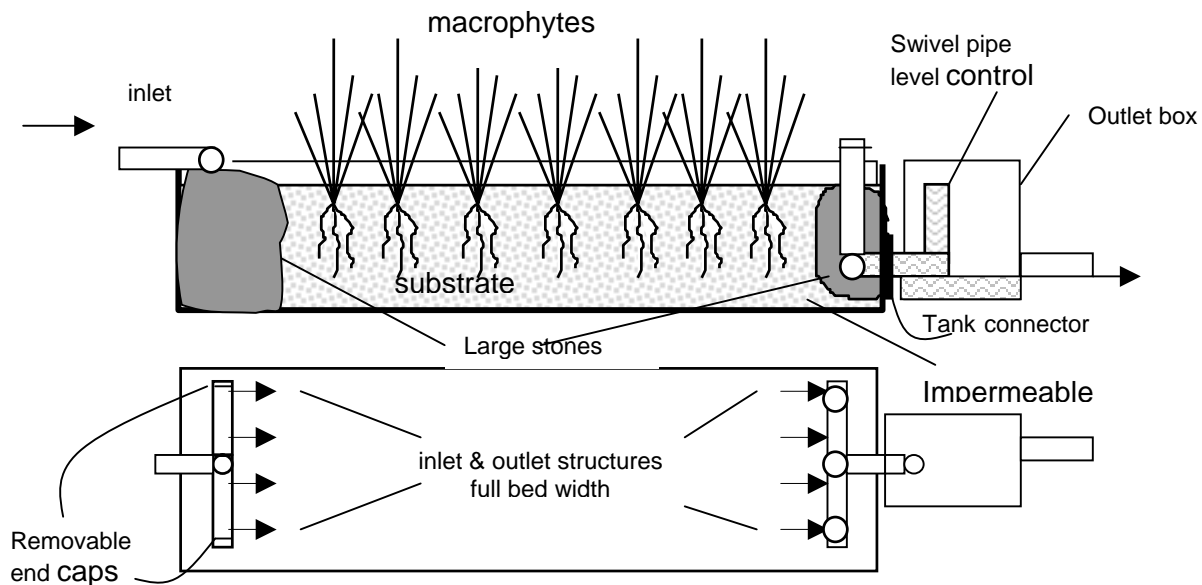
Elevation and plan views of a simplified reed bed showing major components
